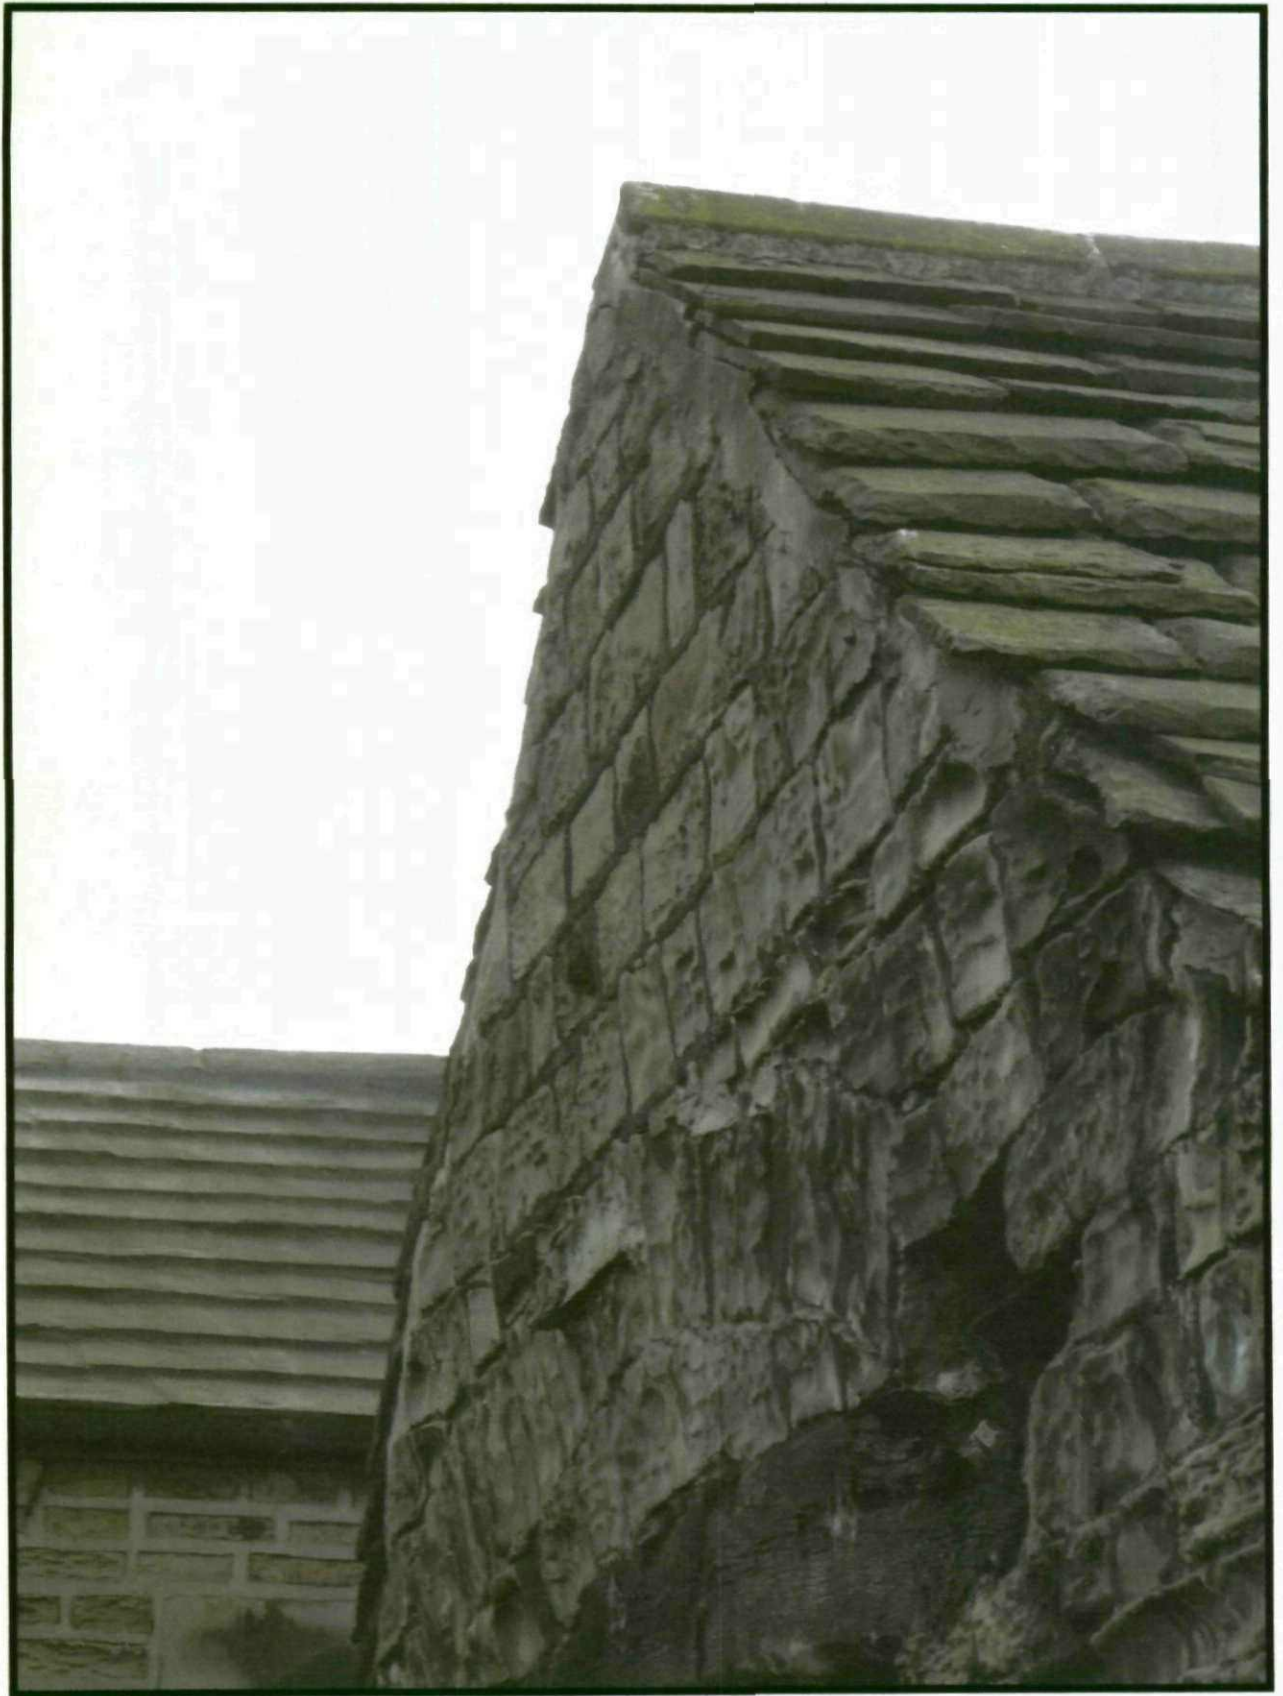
Showing outward lean of North Elevation (Gable)
